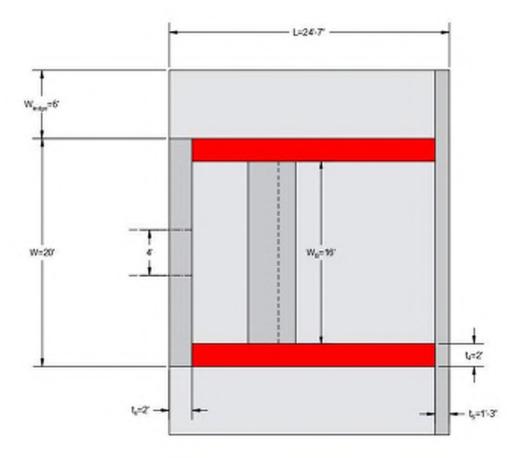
Impact Basin Plan View and Sidewalls (In Red)
